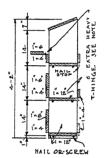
Cross section of nest rack. The nest racks are fastened against the end walls, as shown in Fig. 23. This arrangement is superior to having the nests underneath the dropping board where they are likely to harbor disease and lice.
